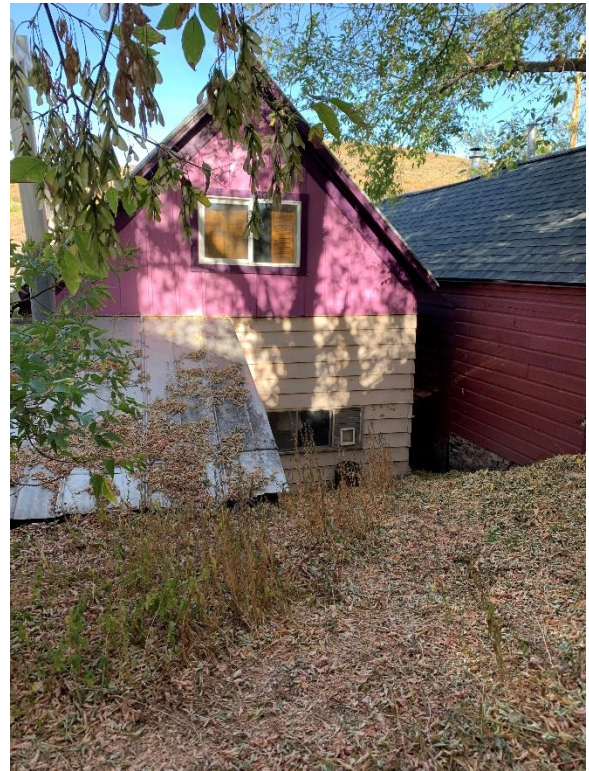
Northwest elevationPhoto 47: West elevationPhoto 46: North elevationPhoto 48: West elevation
